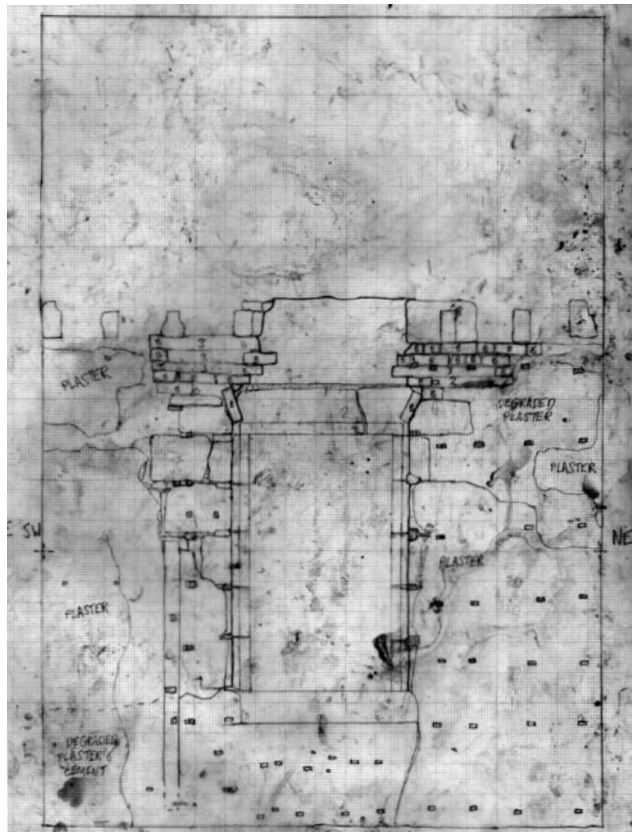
SE facing internal elevation of East Pavilion - Drawing No.001
